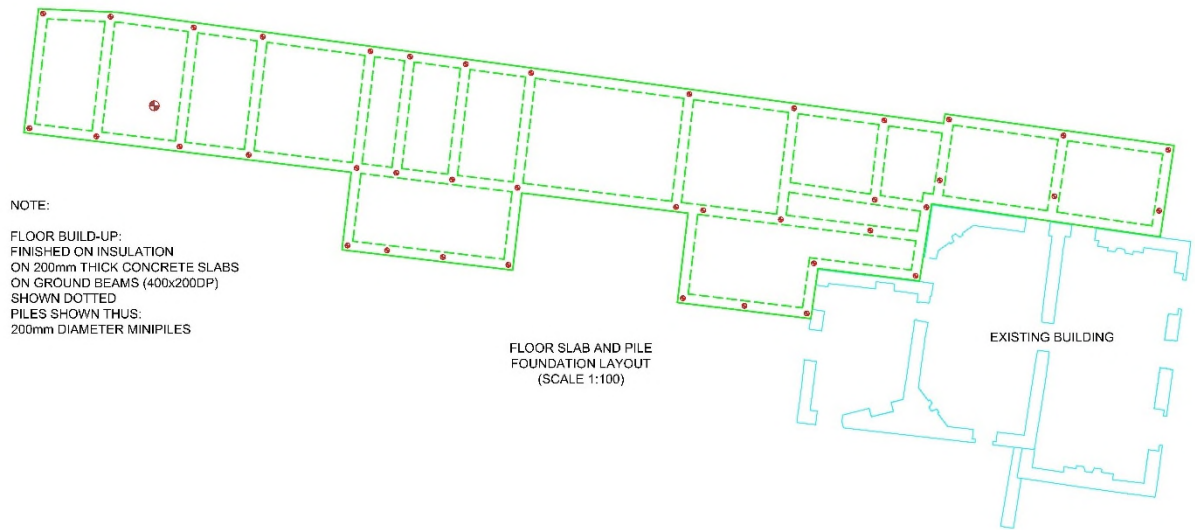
Extension - Proposed Piled Foundation and Suspended Concrete Floor (in green)
